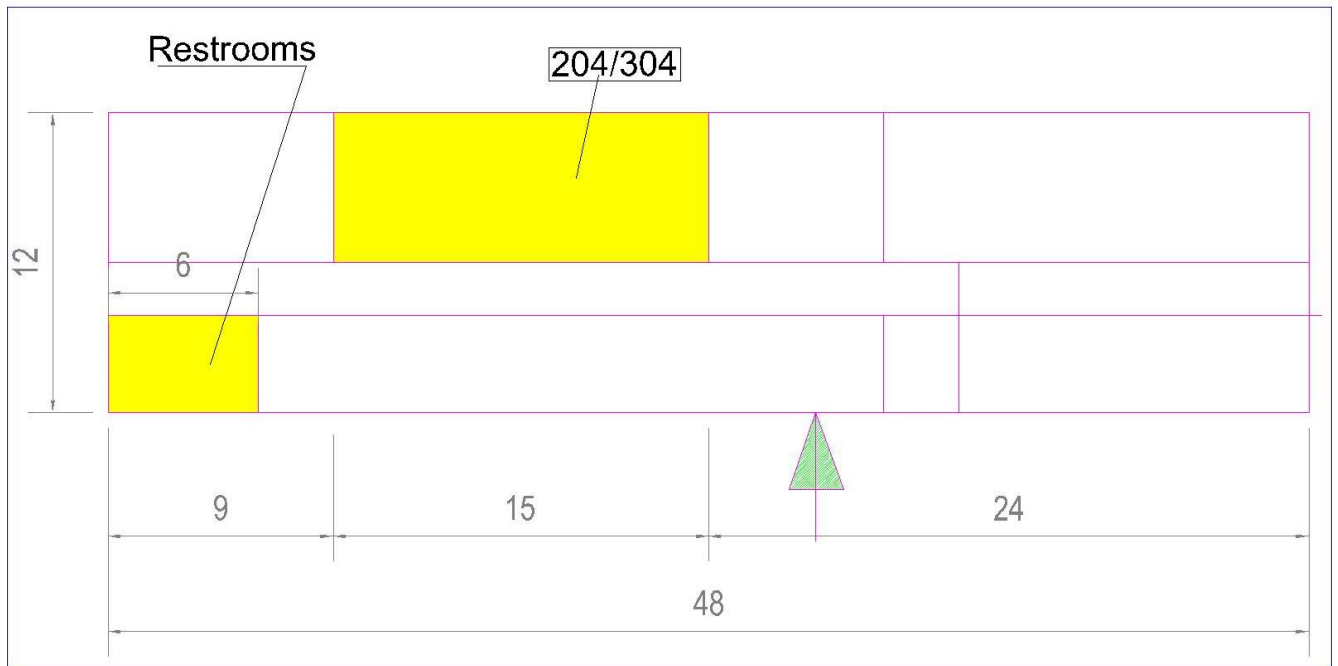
CLASSROOM BUILDING #2, FIRST FLOOR LAYOUT
